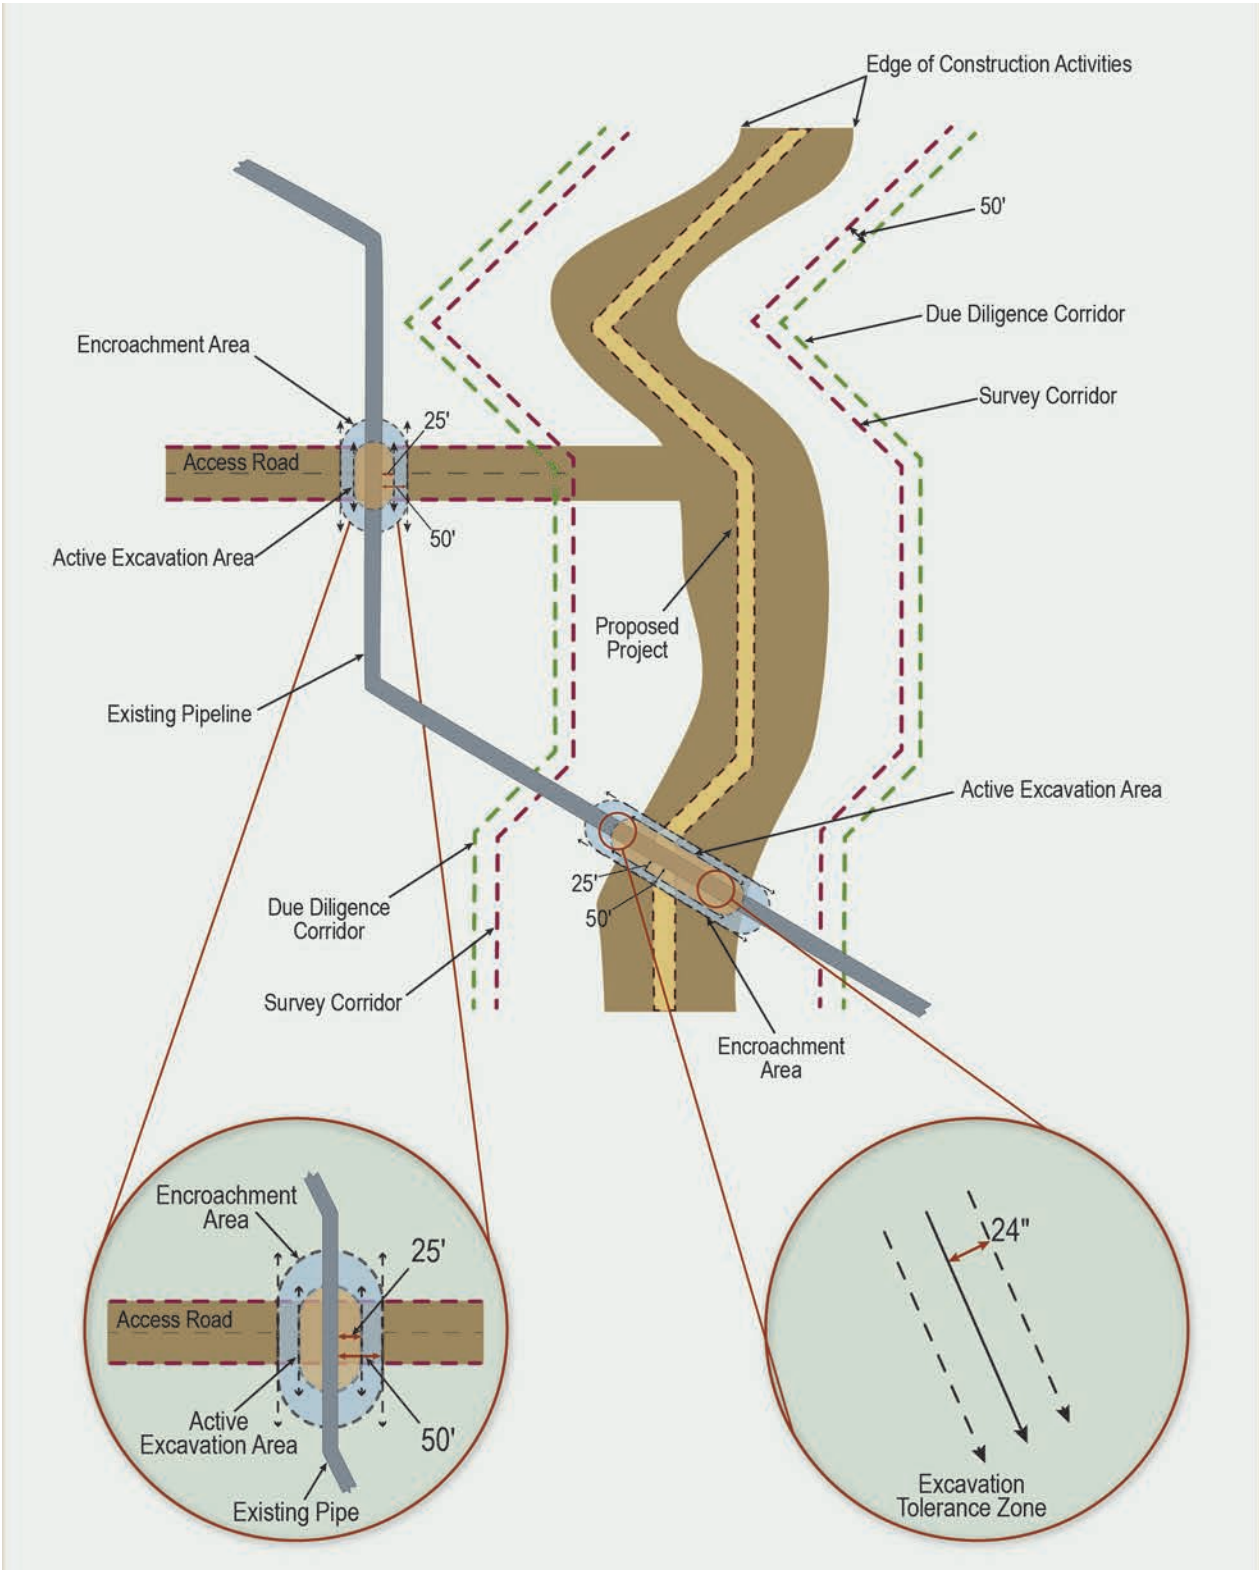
Active Excavation Area and the Excavation Tolerance Zones of an Existing Pipeline
